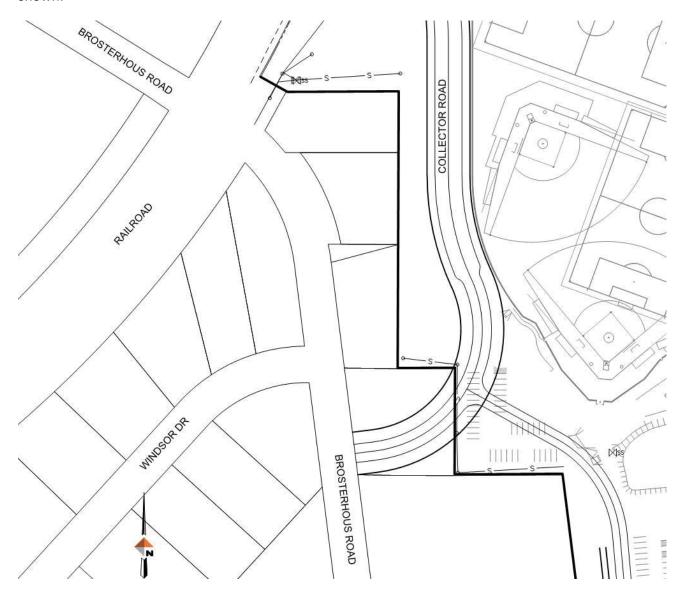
Brosterhous Road Access Location Source: Dowl
